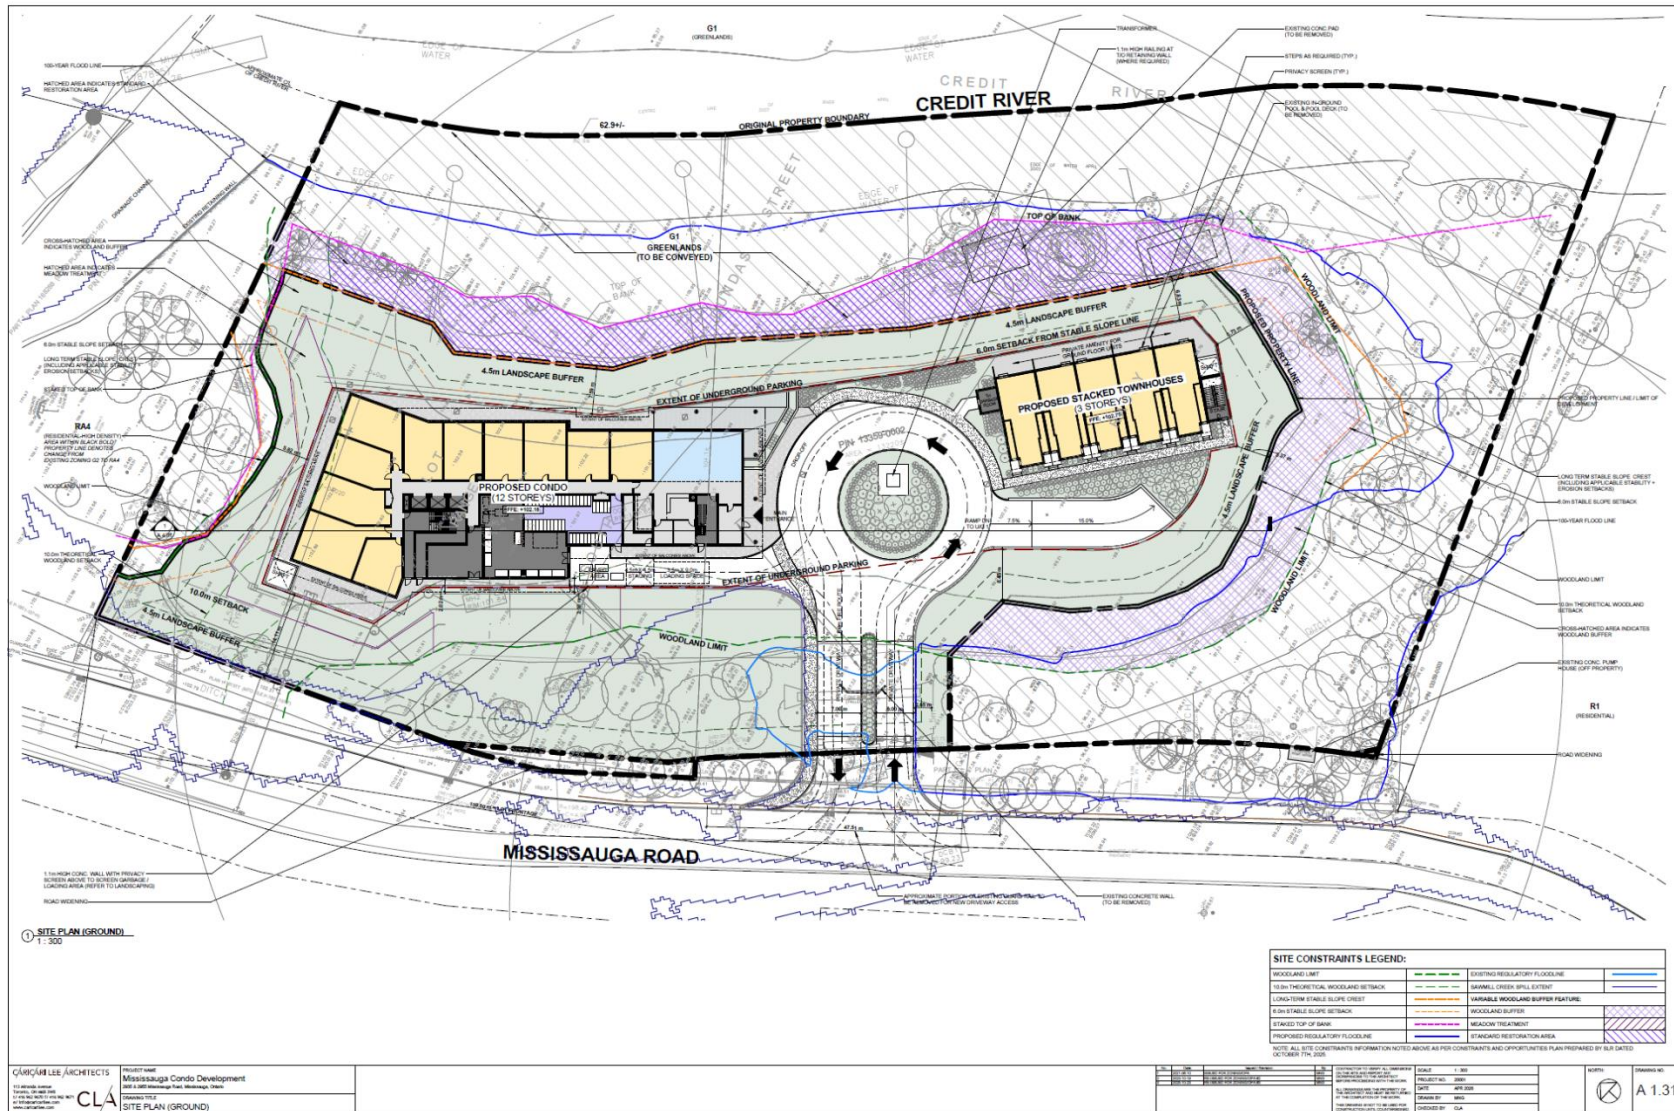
Site plan at ground floor (Caricari Lee Architects, 2026)
